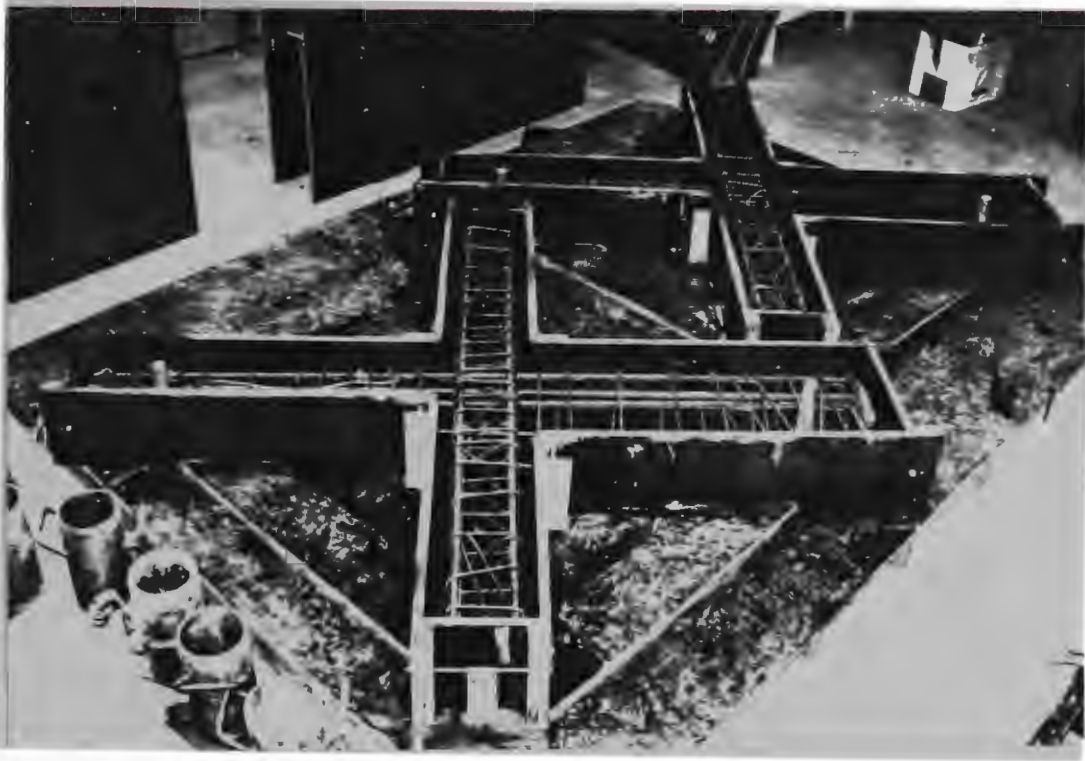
A Pair of Formwork and Reinforcing Cages
